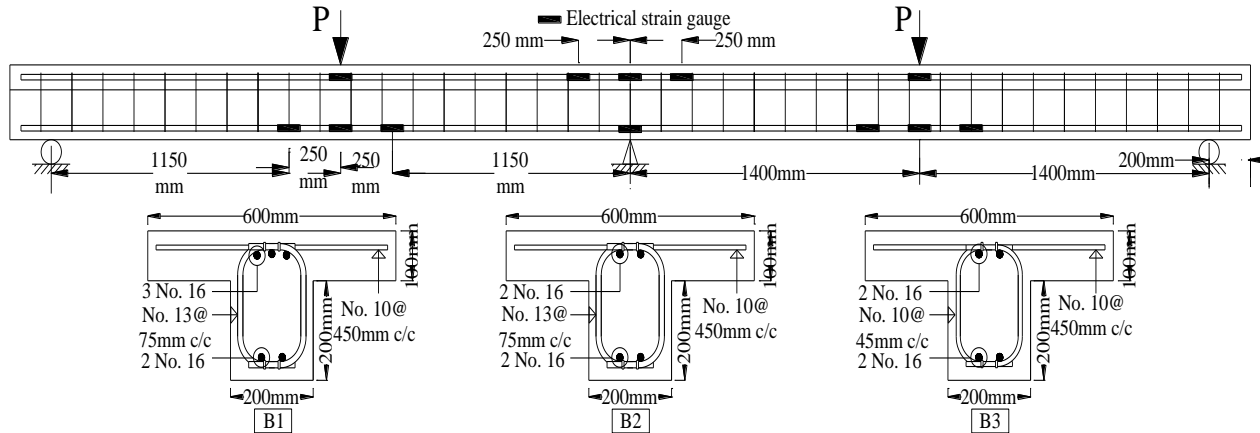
Dimensions, details of reinforcement and internal instrumentation of test beams.
